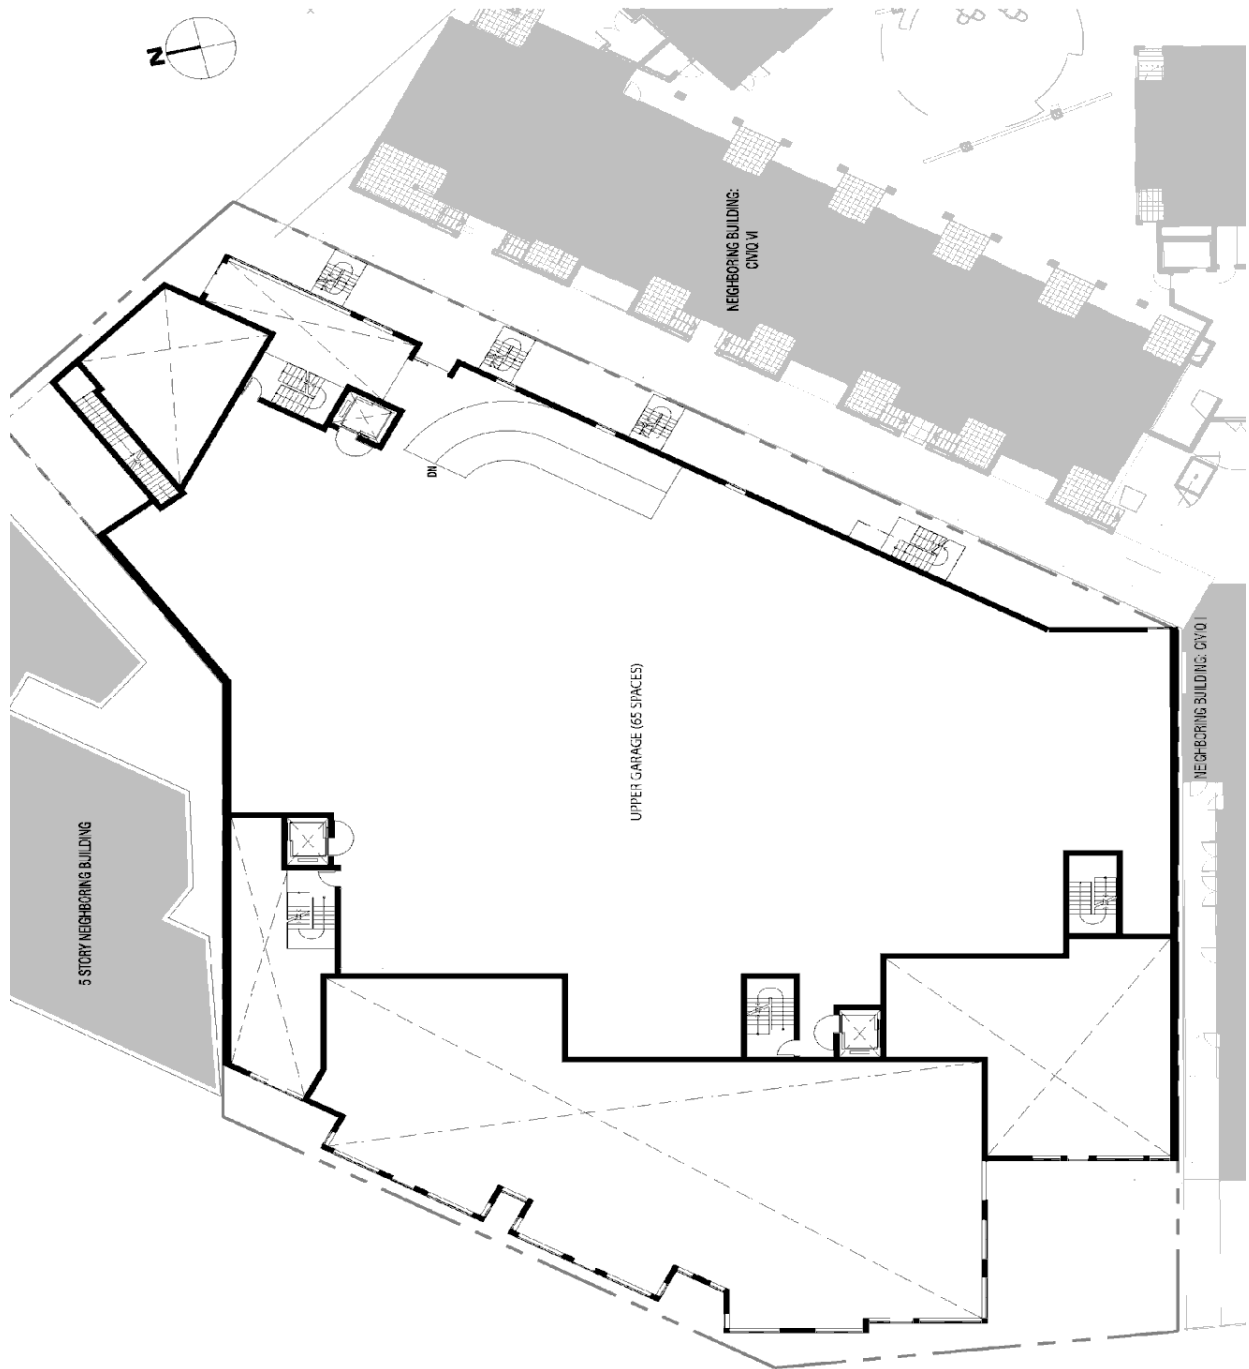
Conceptual Upper Garage Plan. Source: Hauser Architects.
